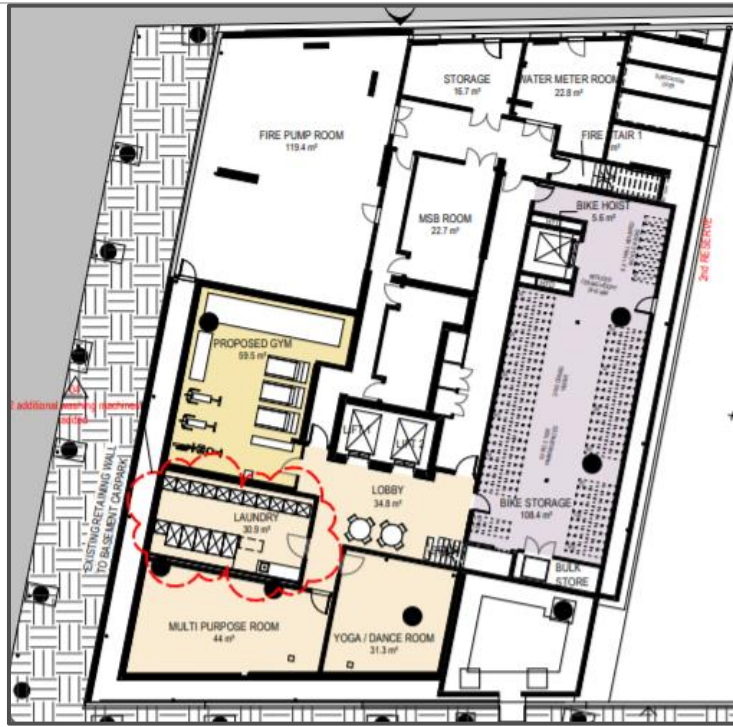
| Proposed basement plan. Additional laundry facilities are shown in red cloud. (Source: Submitted architectural plans)
